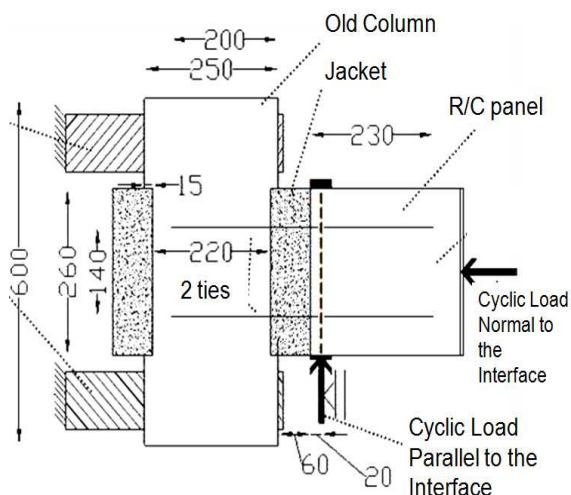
Loading arrangement of a portion of encased R/C panel and the jacketed column
